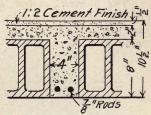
Beam and Tile Floor, National Fireproofing Co.
